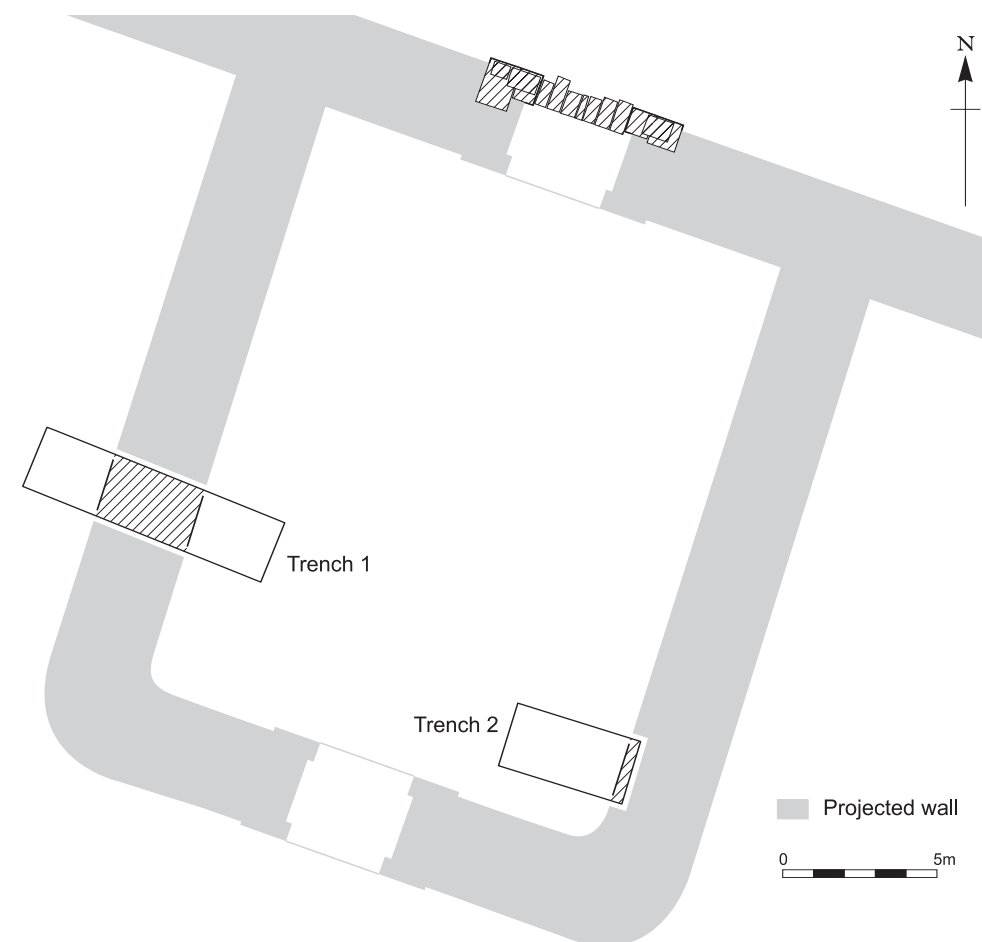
Milecastle 10: plan of Mc10 summarising trench positions and current plan is somewhat stylised from measurements taken on site owing to difficulty of access for accurate drawing.
